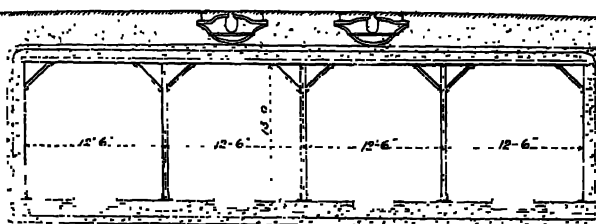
New York Rapid Transit Railway, showing also the tracks and conduits of the electric surface tramway.
